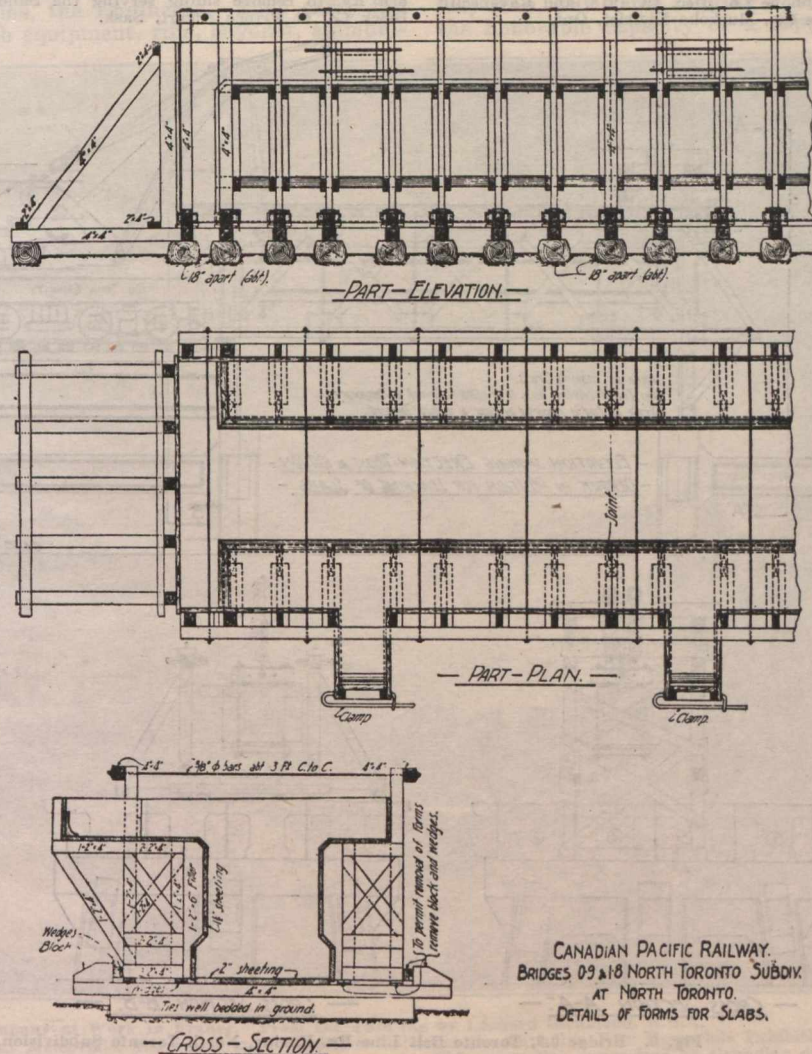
Bridges 0.9 and 1.8, North Toronto Subdivision, C.P.R. Details of forms for slabs.
